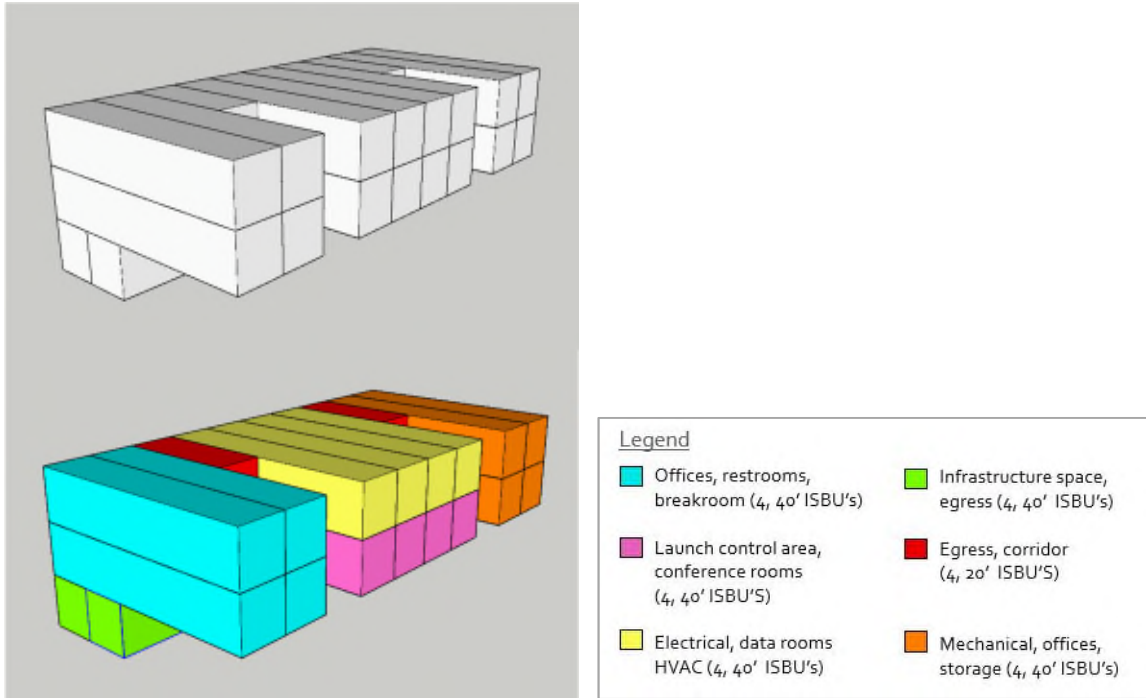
4: Scheme diagram for shipping container building and Building W-20 replacement.
